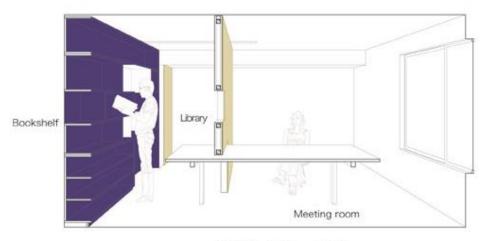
Space transformation in bedroom. Photo Credit: Ryohei Hamada, Source: Archdaily, https://www.archdaily.com/83661/switch-yuko-shibata
